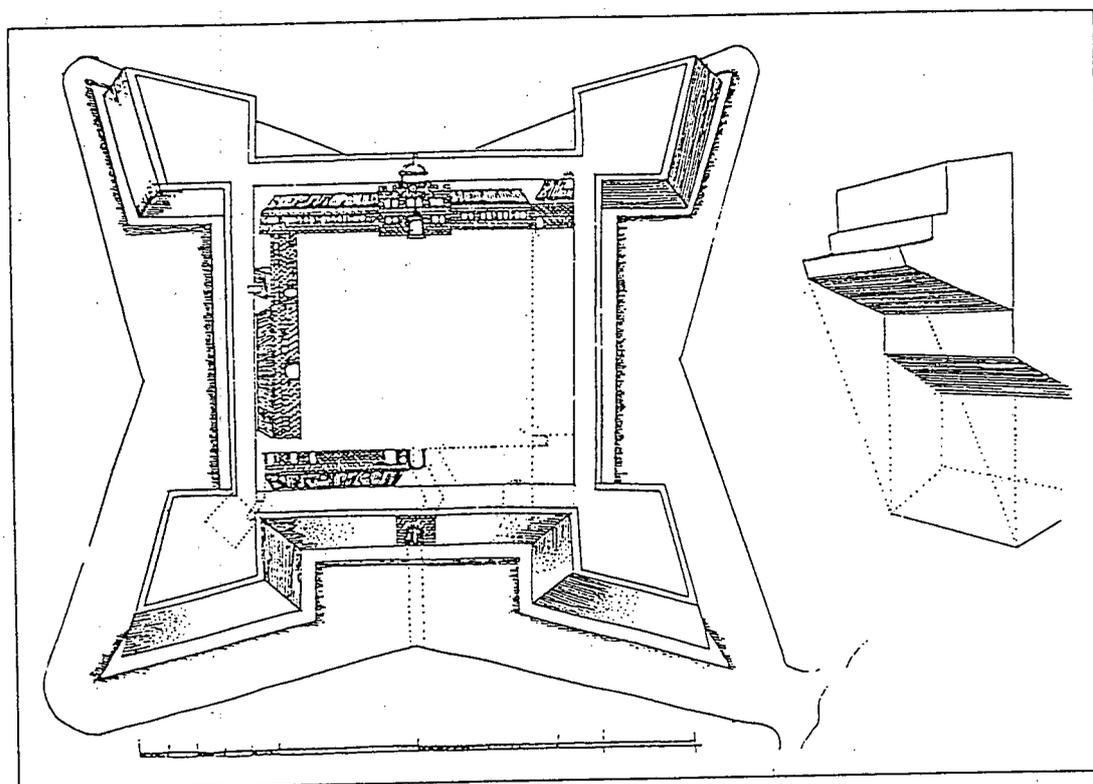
Plan of the Fort 1653, Cape Archives, M1/21.
